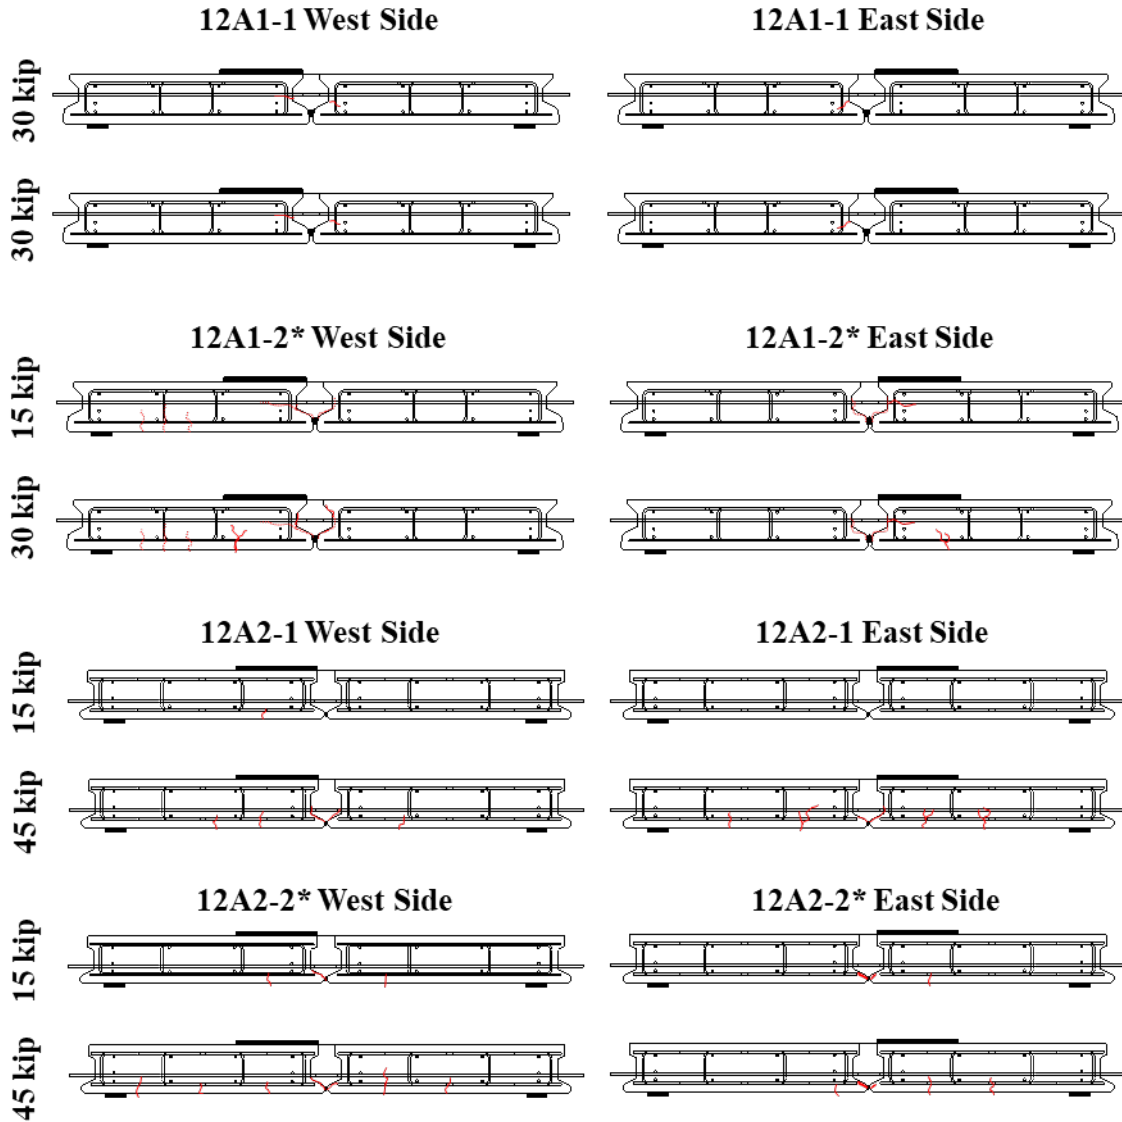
Crack pattern of 12-inch specimens (dashed lines indicate cracks formed in the cyclic stage) (cont.); *strength test performed after fatigue testing
